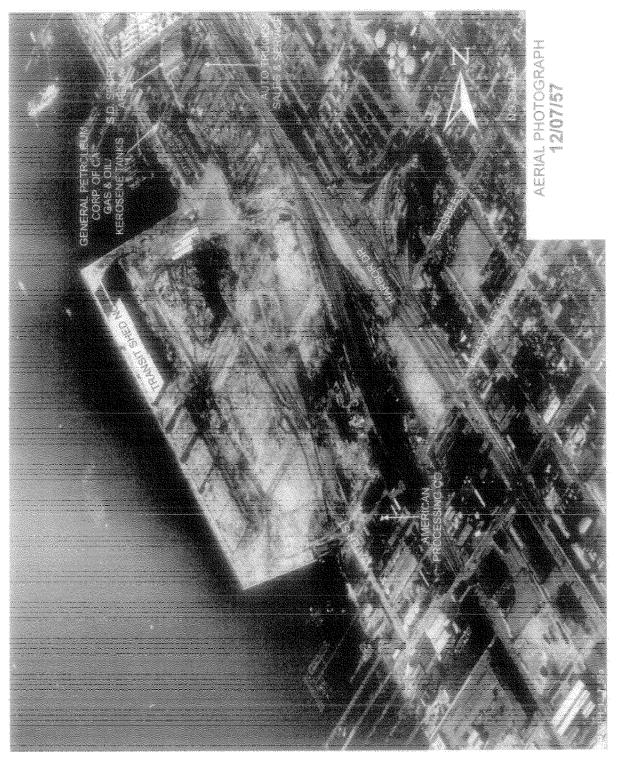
c. 1957. 10th Avenue Marine Terminal with area filled and building foundations under construction. (Ninyo and Moore, 1999)
